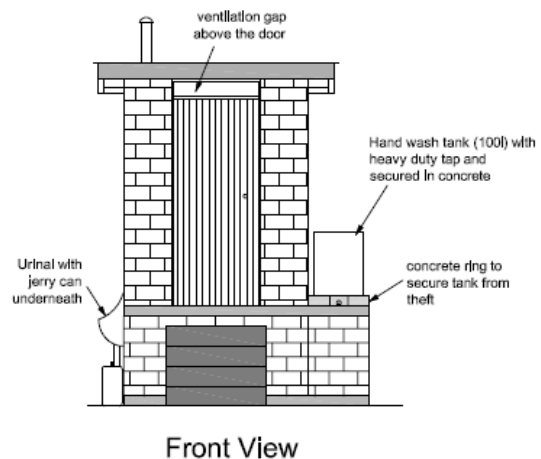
Design drawings of UDDT (for website link of drawings see Section 13)
